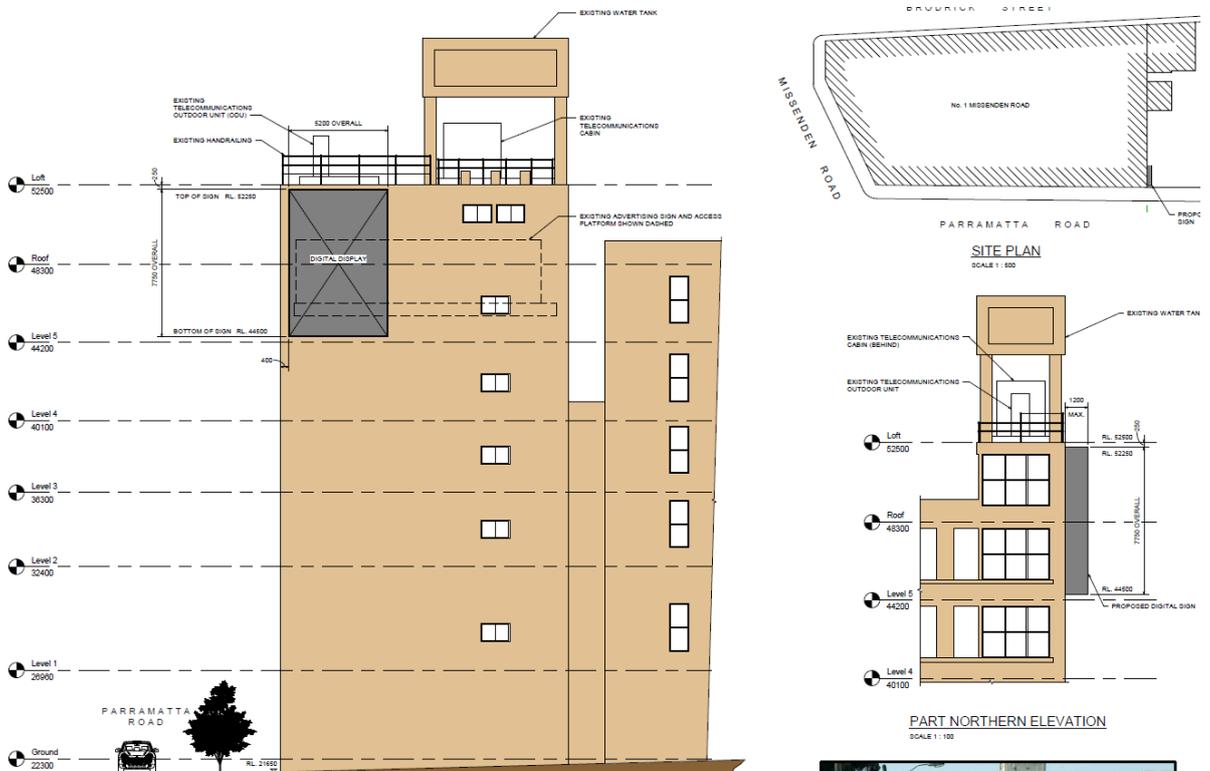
Proposed western and northern elevations of the replacement LED digital sign.
